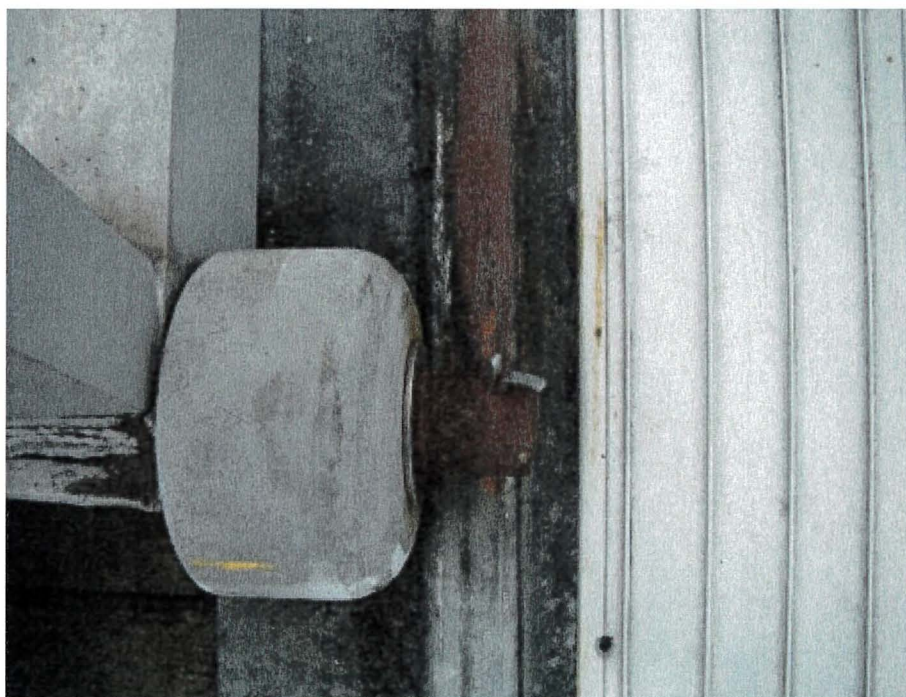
West Main – Access Gate. Left Side View. Spalling on Concrete Abutment
